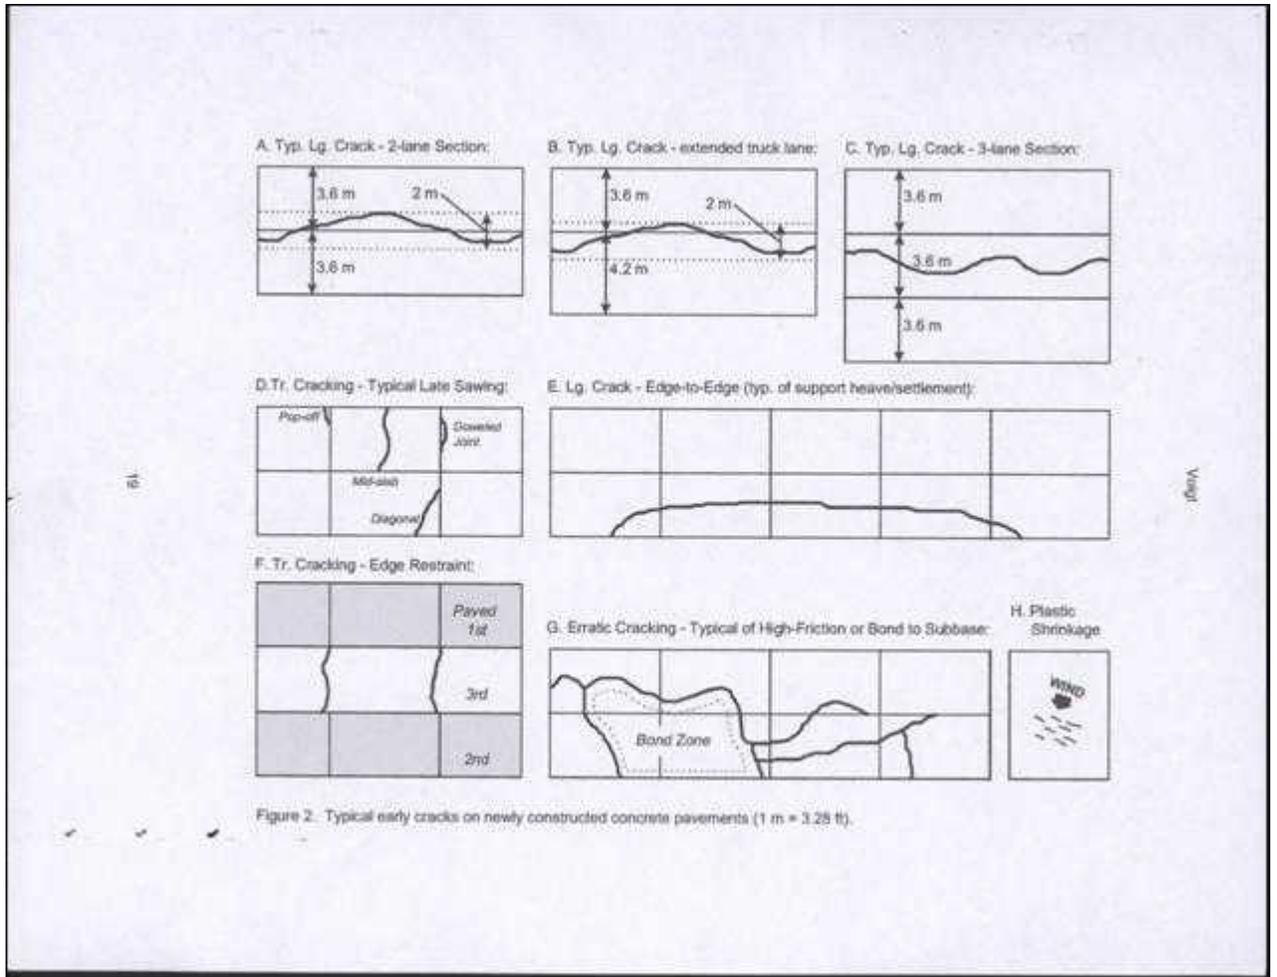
Typical early cracks on newly constructed concrete pavements (1 m = 3.28 ft).
